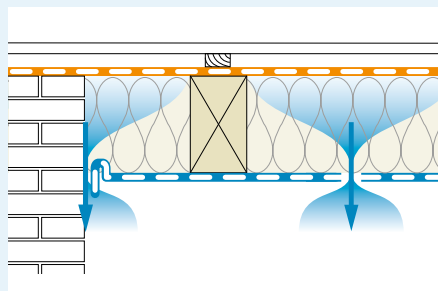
Dry cold air penetrates through gaps under wind effects, non-airtight connection, the airtight building envelope is not continuous and closed
